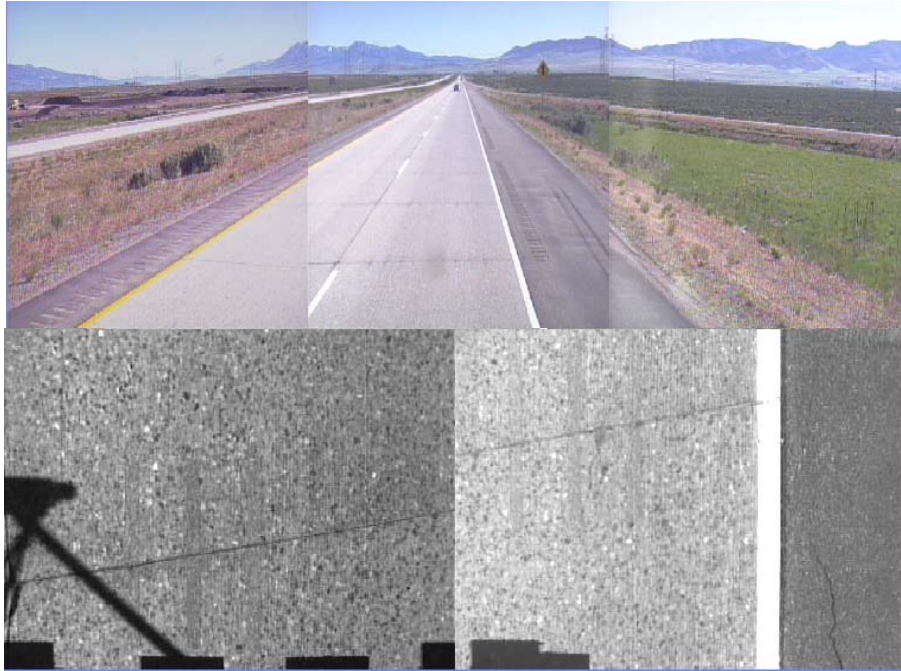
Dowel bar retrofit in Idaho (Santi, 2008).
